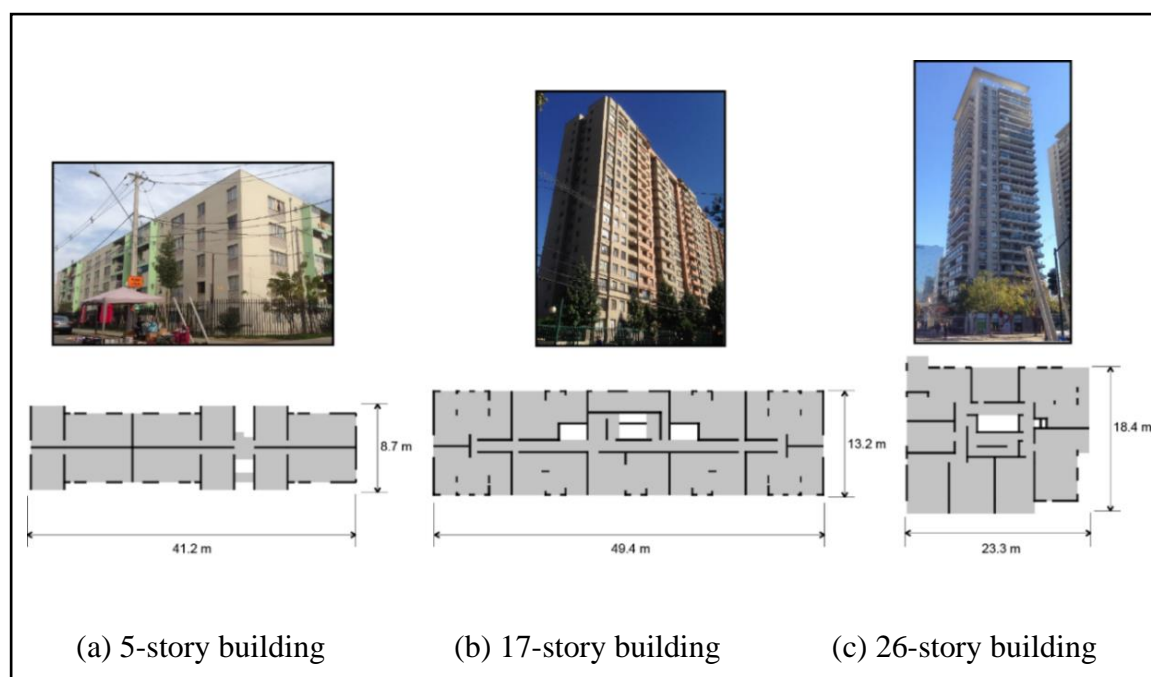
Picture and typical floor plan of the three selected buildings.
